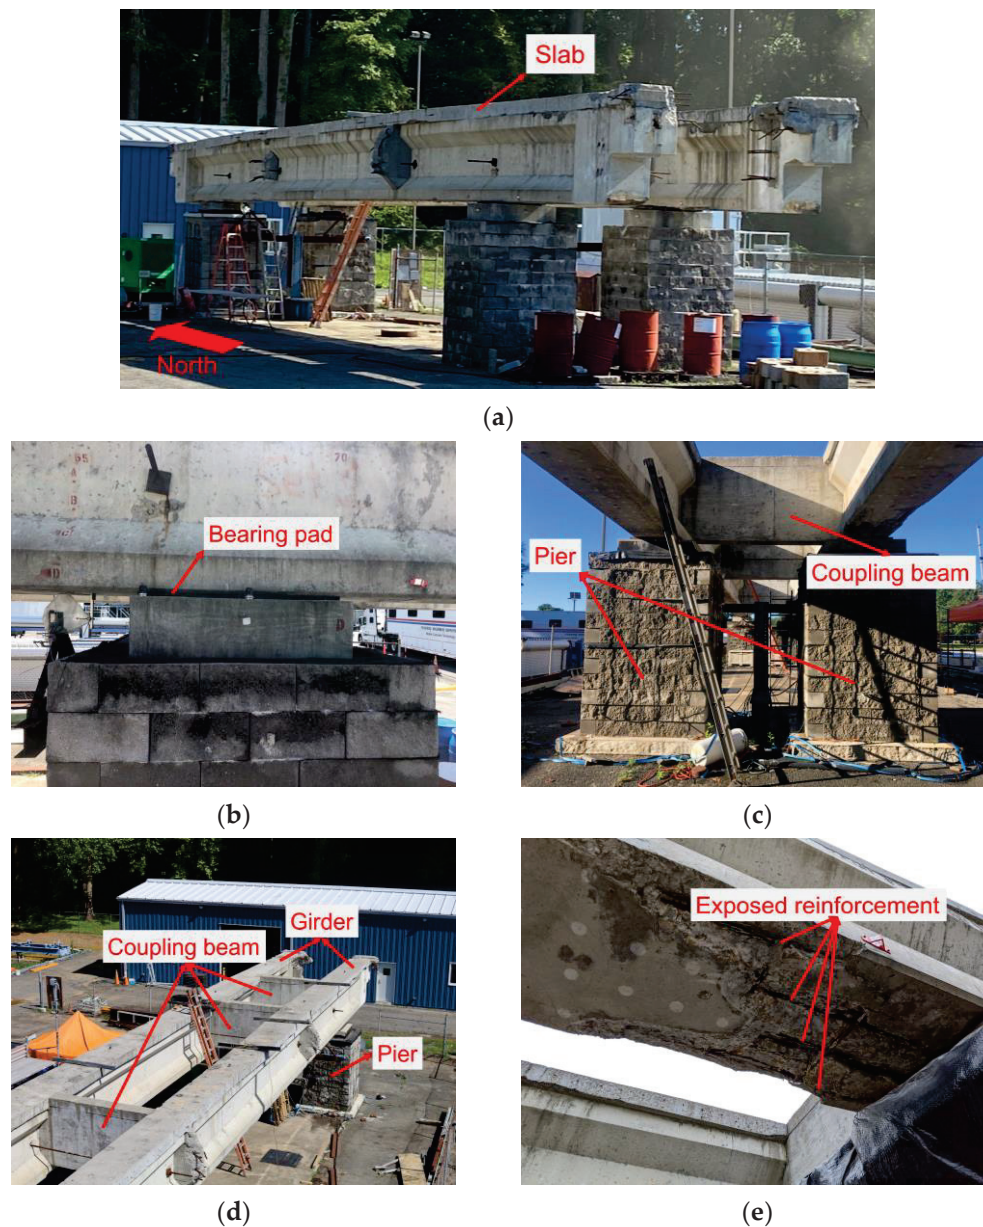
Testbed structure: (a) side view and north direction, (b) bearing pad, (c) piers and coupling beam, (d) top view, and (e) example of existing damage (west girder close to the north pier).
